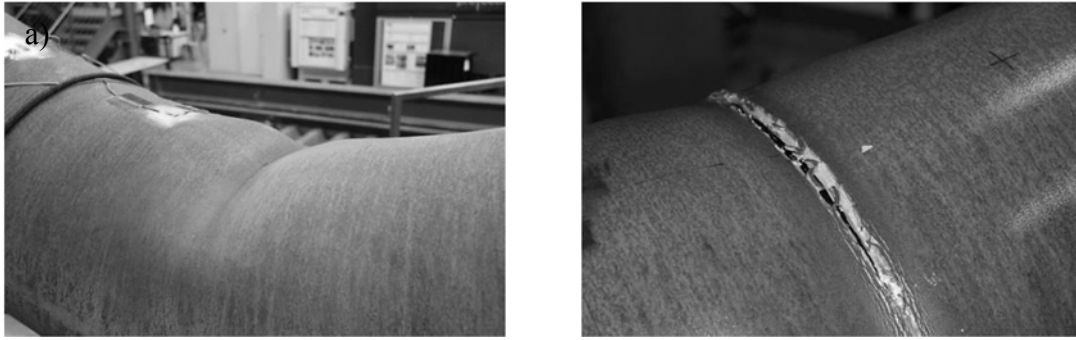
Failure aspect of SP3 specimen: a) buckle detail; b) detail of the crack at the end of the test.
